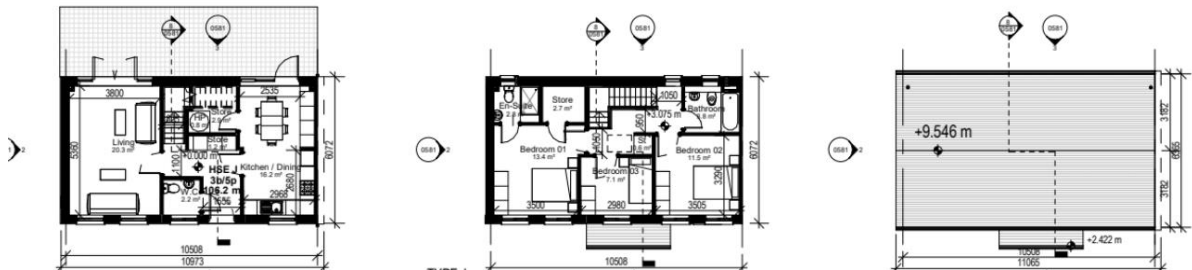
Proposed ground (left) first (middle) and roof (right) plans of House Type N.
